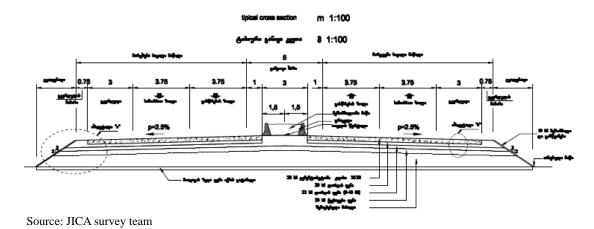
Standard Cross Section (Completed, Earthwork Section)
